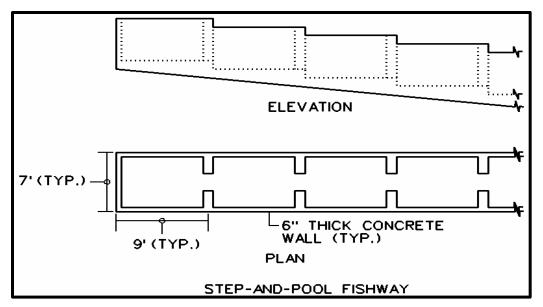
Step and Pool Fishway Plan and Elevation
